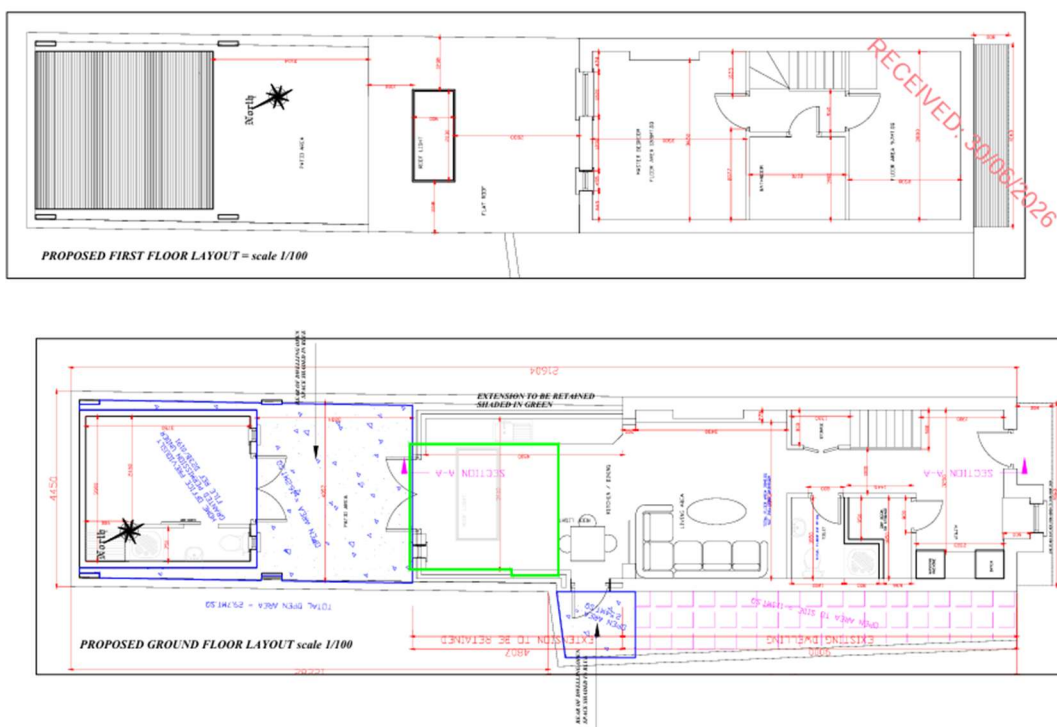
As-built floor plans – “proposed” to be retained (Source: Submitted drawings)
